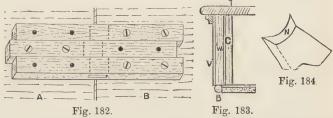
Cramping Joint by Inserting Wedges, Fig. 183.—Well Section showing Substitute for Return Bead. Fig. 184.—End of Winder near Well.
